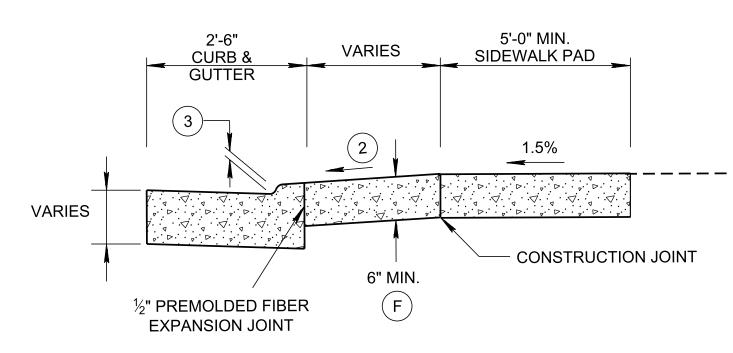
DETAILS OF LOWERED STANDARD CONCRETE DRIVEWAYS
